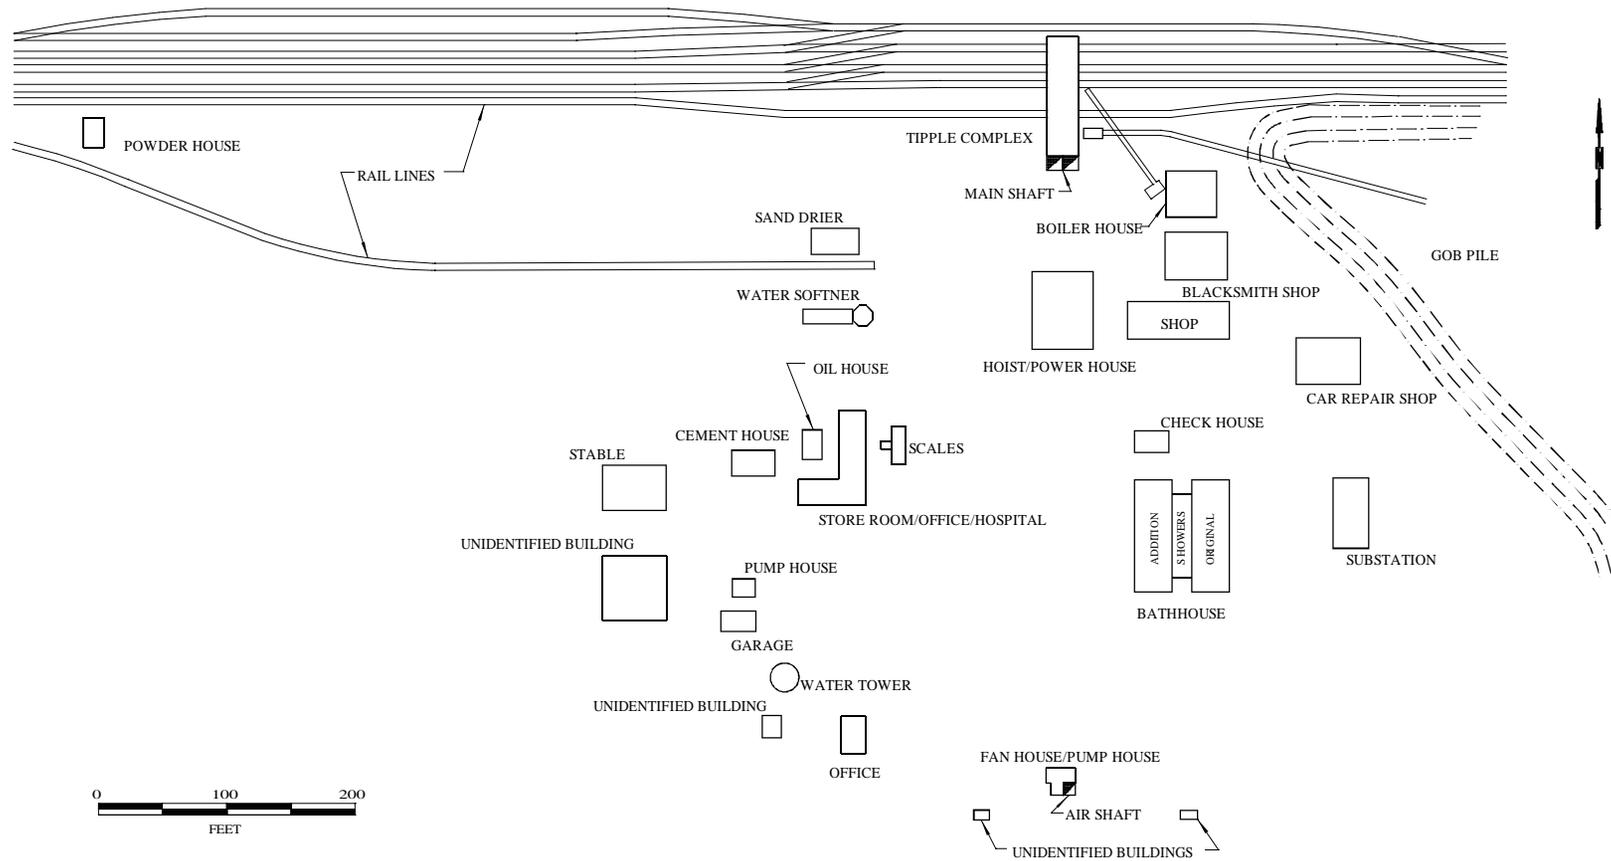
Site plan based on the previous figure, showing only the surface improvements at the mine.
